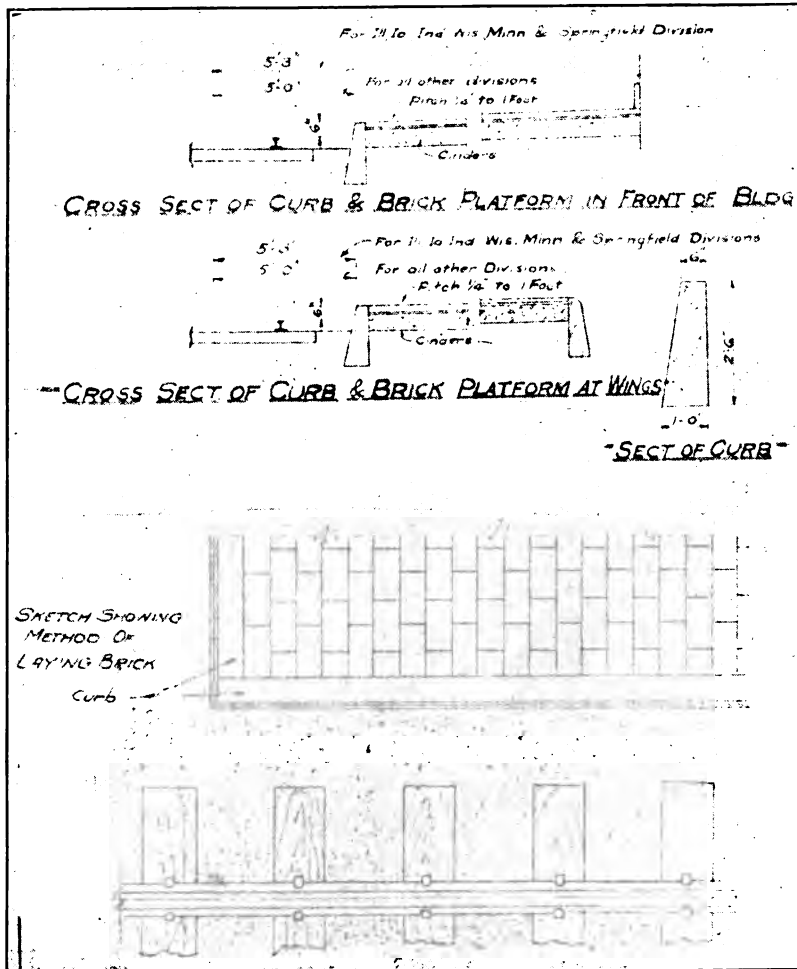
Fig. VII. Cross-Sections of Brick Platform and Curb—Illinois Central R. R.
